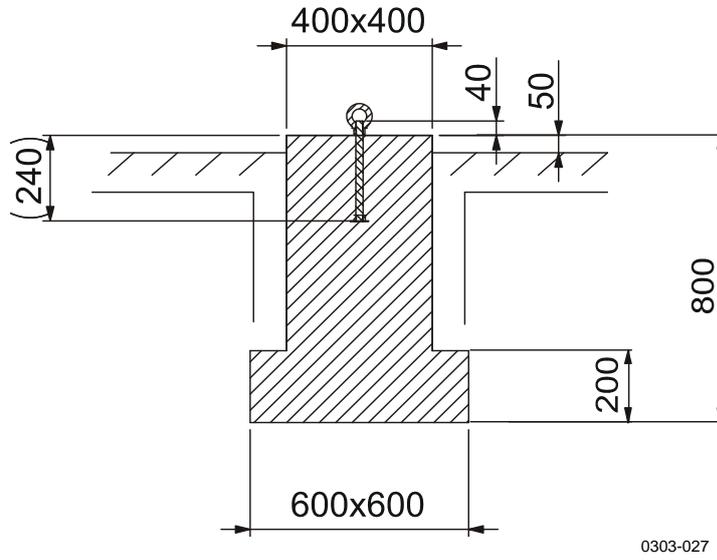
Concrete Block for Guy Wire (Dimensions in mm)
